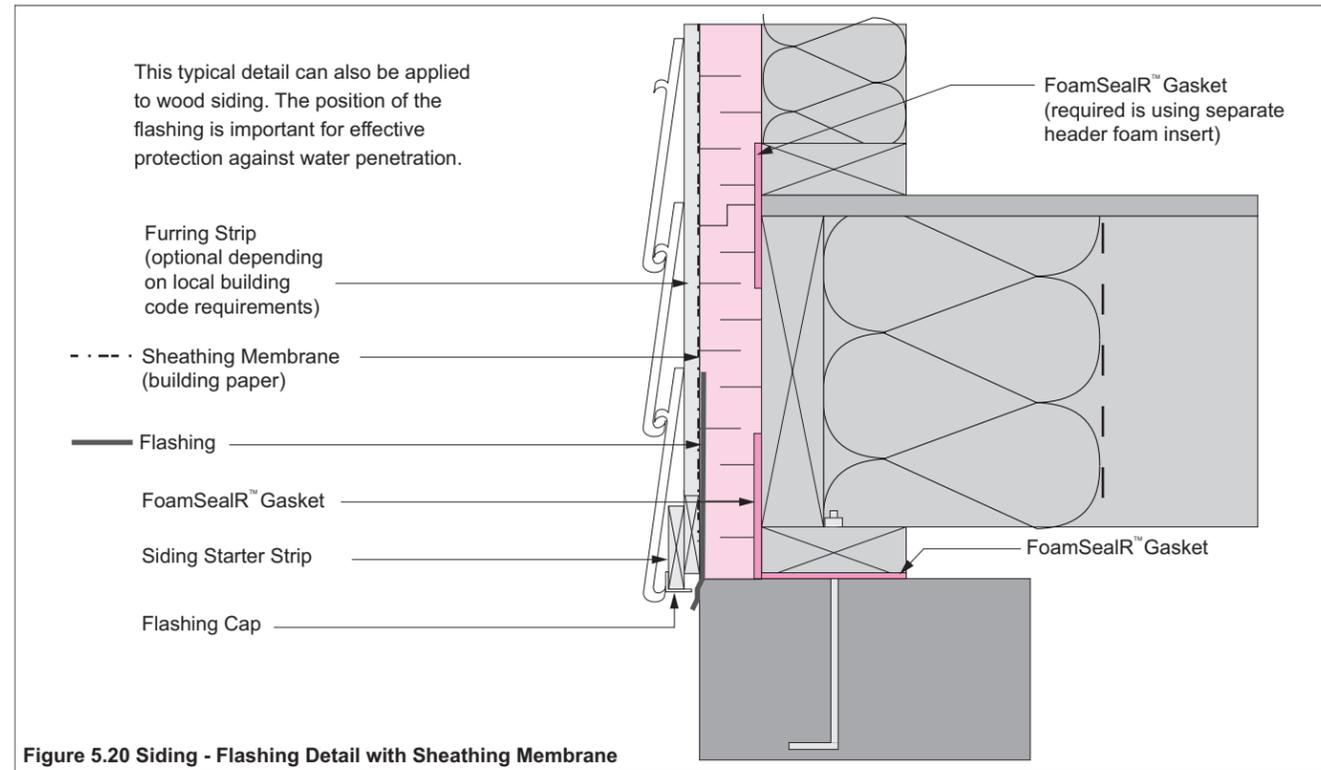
Siding - Flashing Detail with Sheathing Membrane
